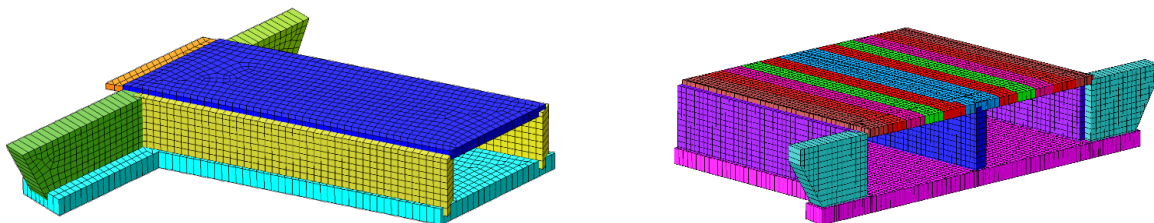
Finite element models of the two case study bridges (left: bridge “81/2”; right: bridge “79/1”)
